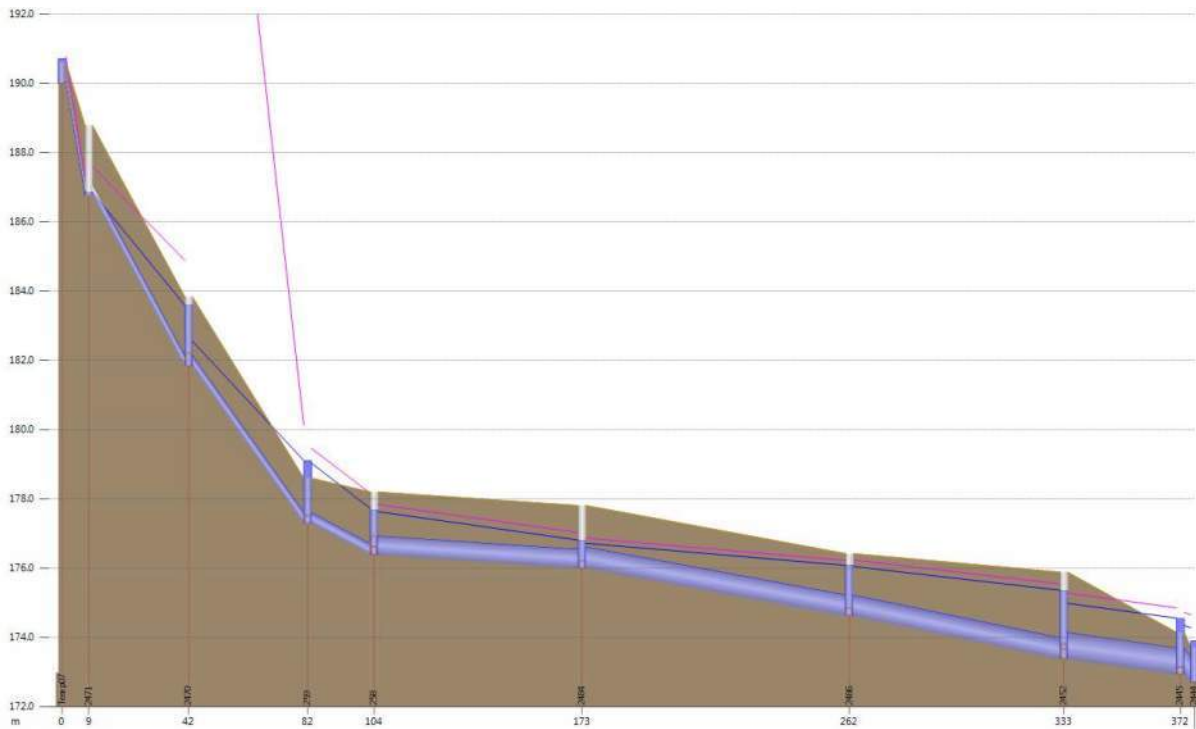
20 yr 1 hr Long section from top of Classic Drive to outlet headwall (post-development)
